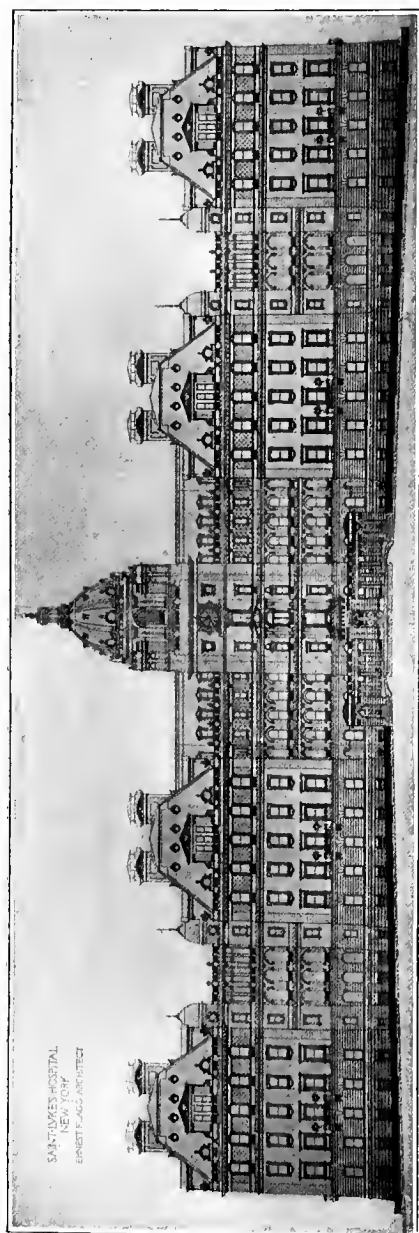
ELEVATION OF ST. LUKE'S HOSPITAL ON 113TH STREET, NEW YORK CITY.
